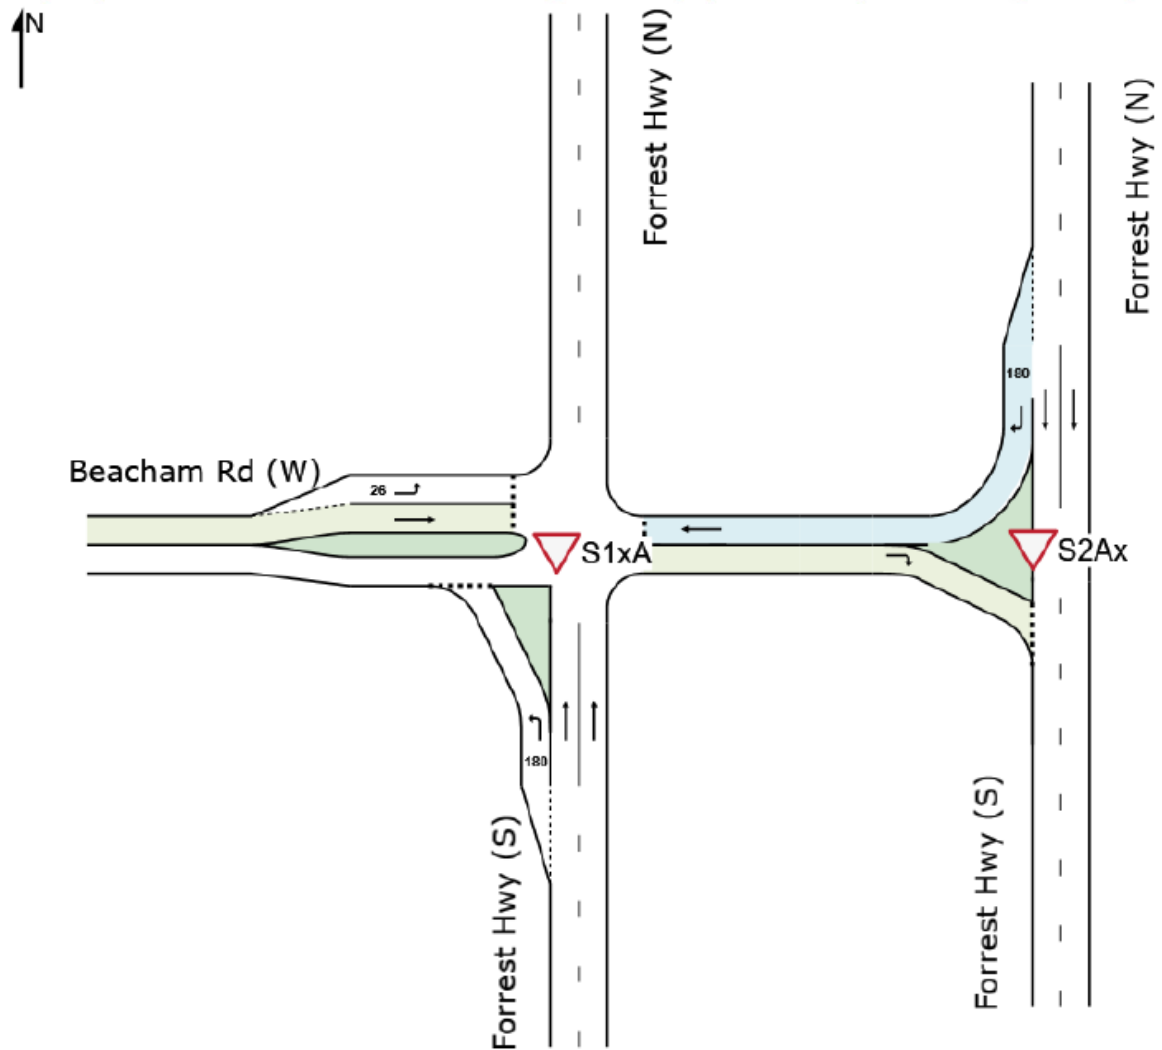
Forrest Hwy / Beacham Rd intersection existing layout modelled in SIDRA Network
